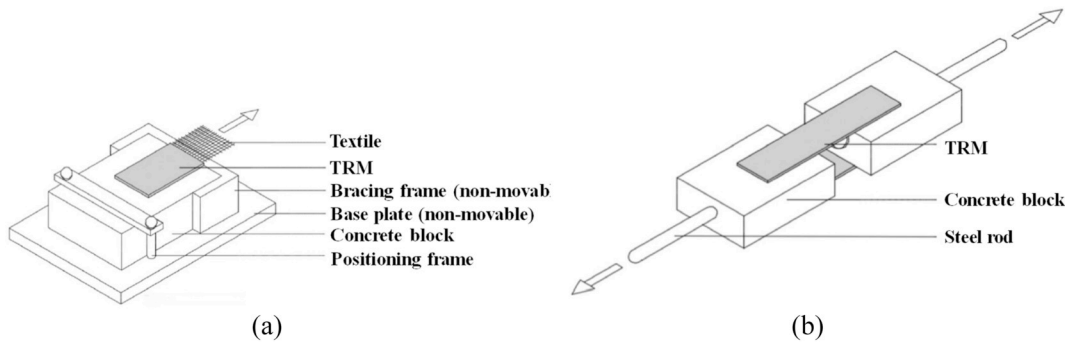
TRM-to-concrete test methods [37]: (a) Single shear lap test; (b) Double shear lap test.
